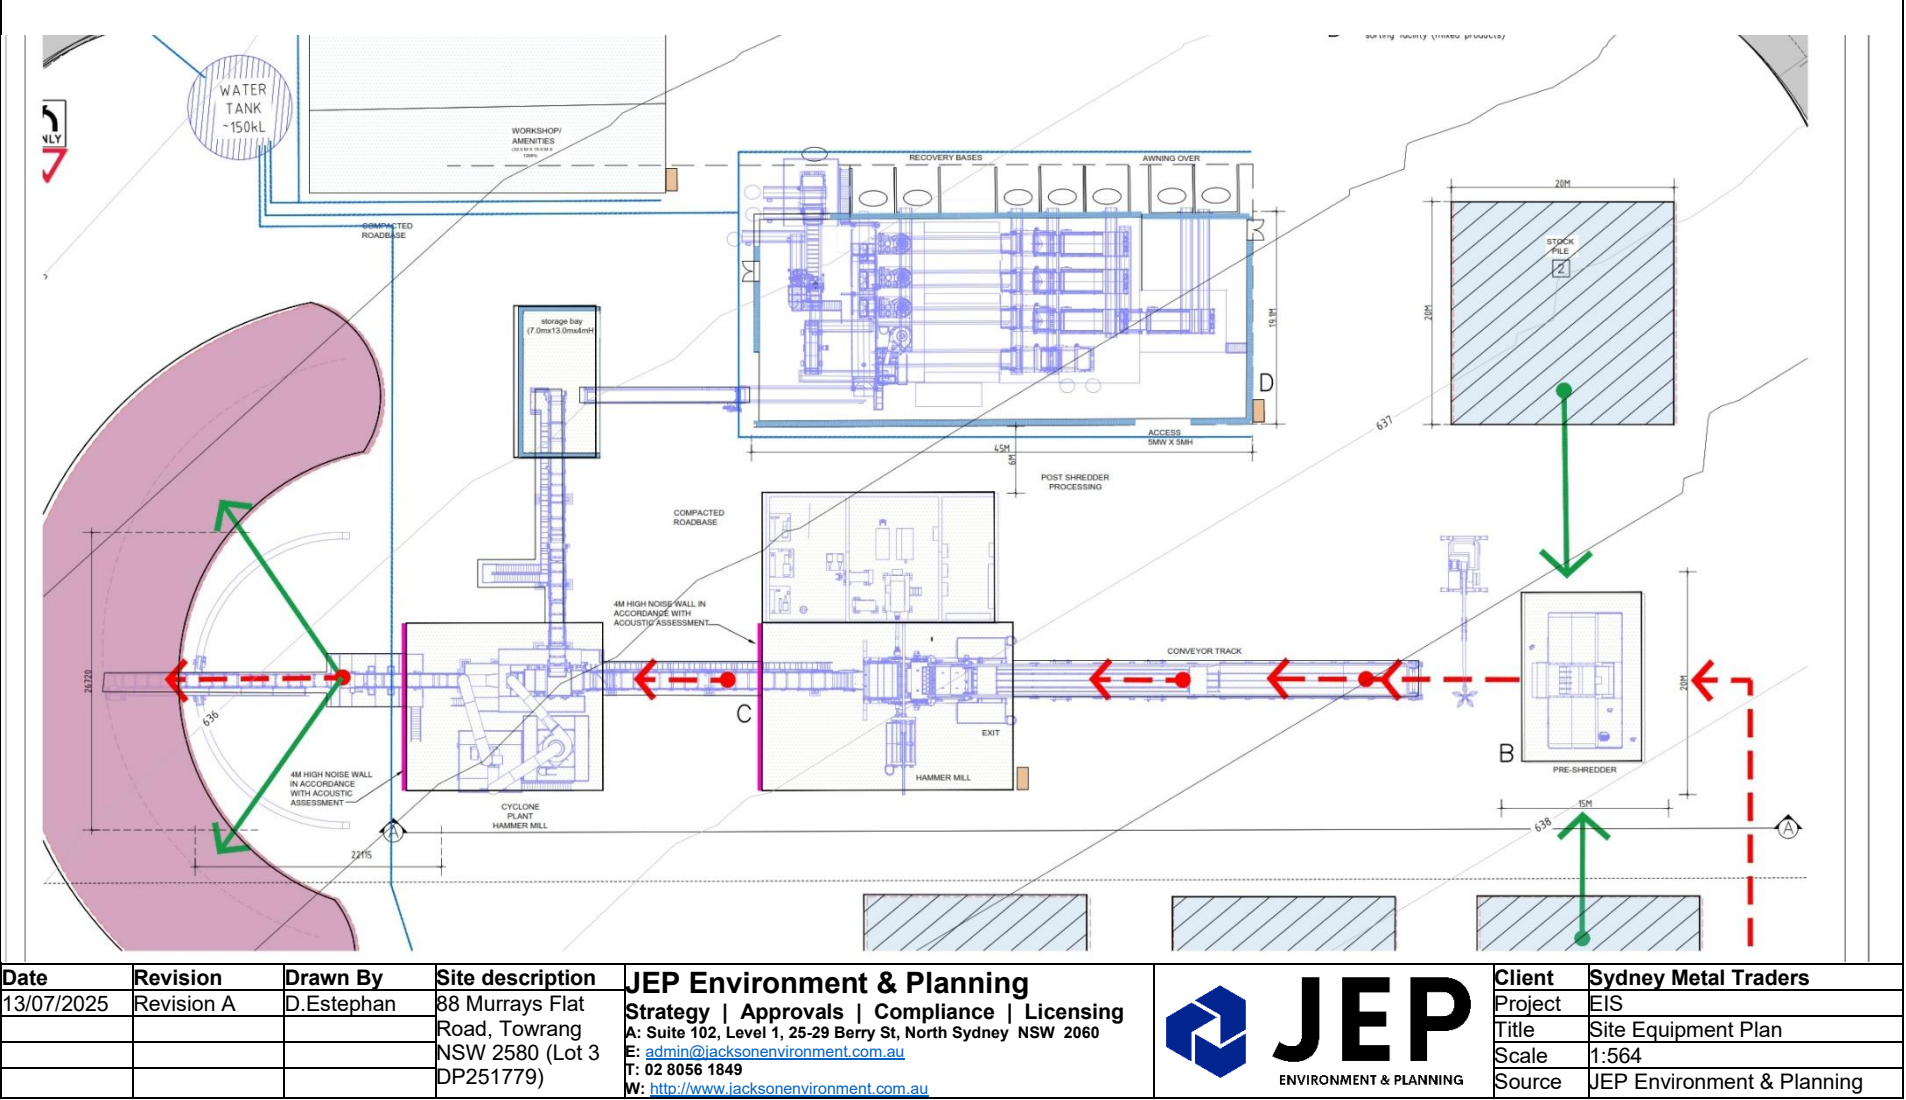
Site Equipment Plan. See Appendix 1 for the high resolution plan.
